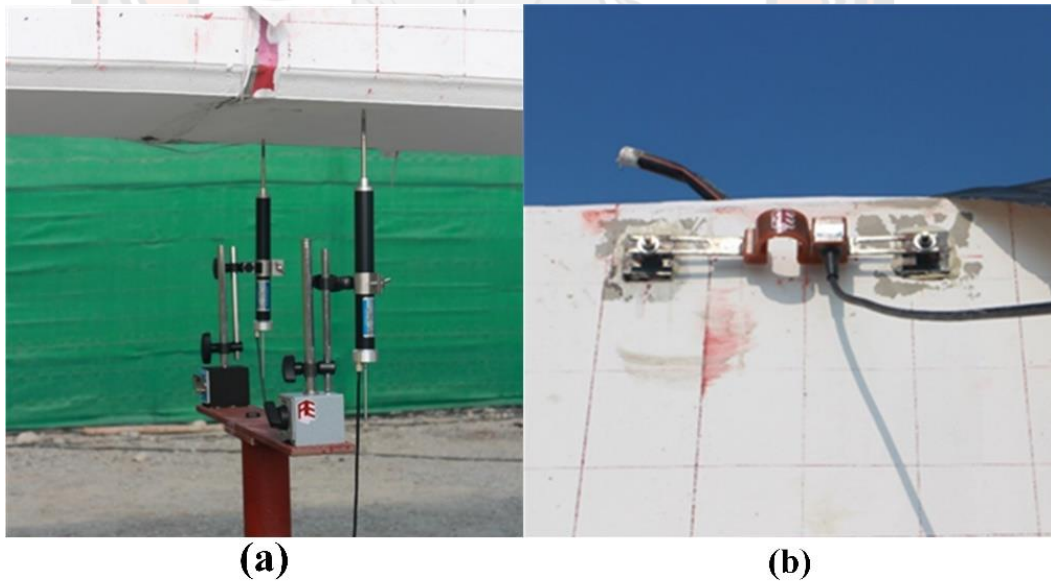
Typical installation of LVDTs and crack gauges; (a) Installation of LVDTs and (b) Installation of crack gauges.
